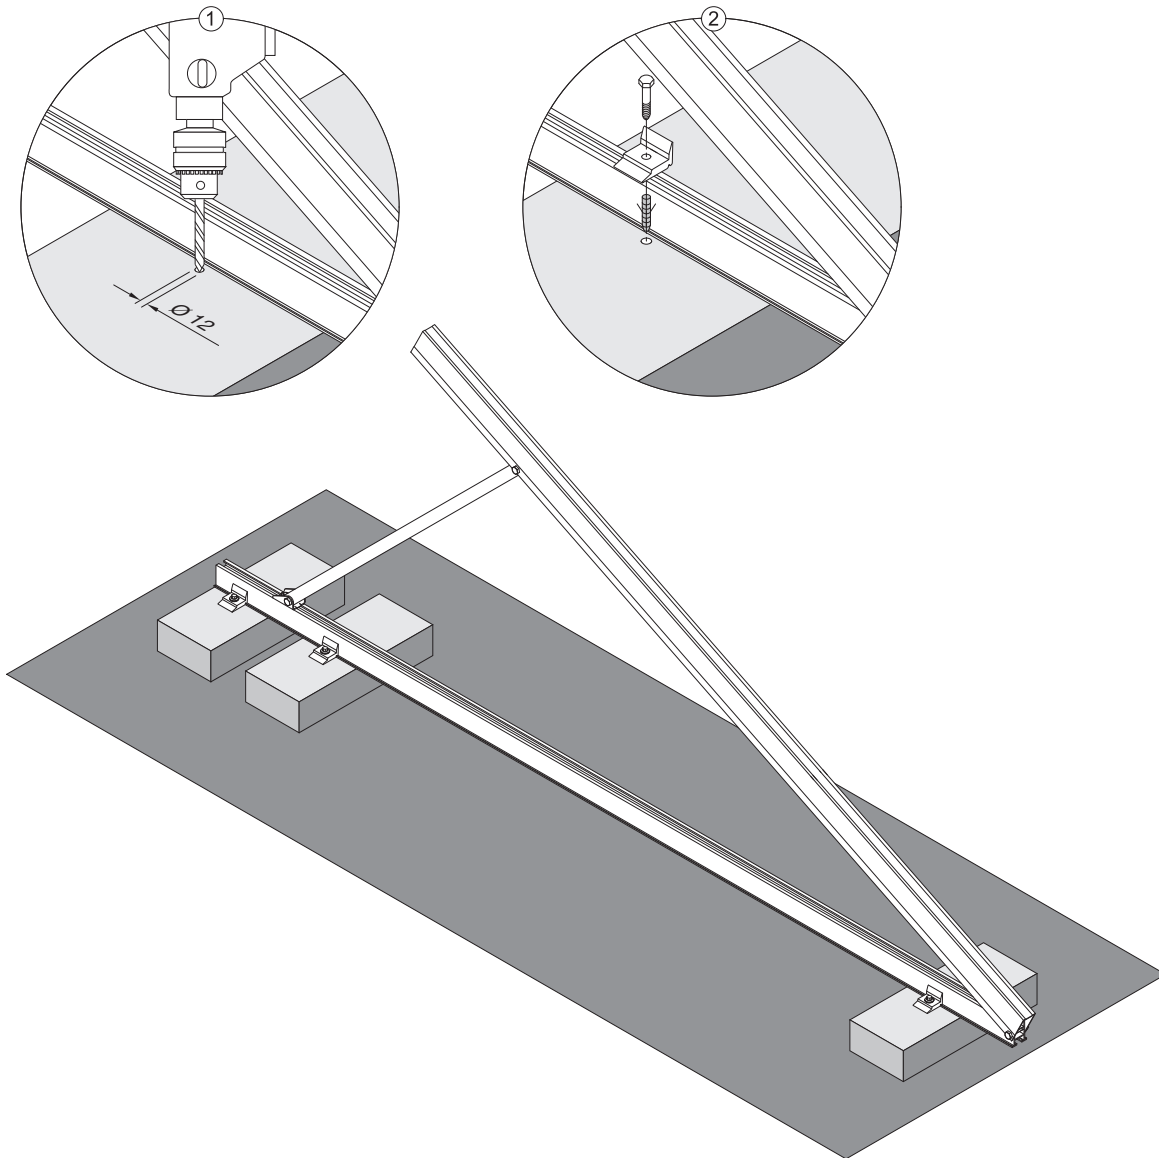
Fixing the racking triangles on concrete slabs placed on protective underlay.
